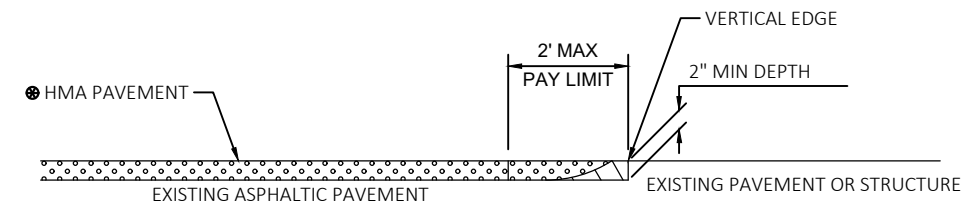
DETAIL FOR TYPICAL DRIVEWAY PAVING LIMITS
